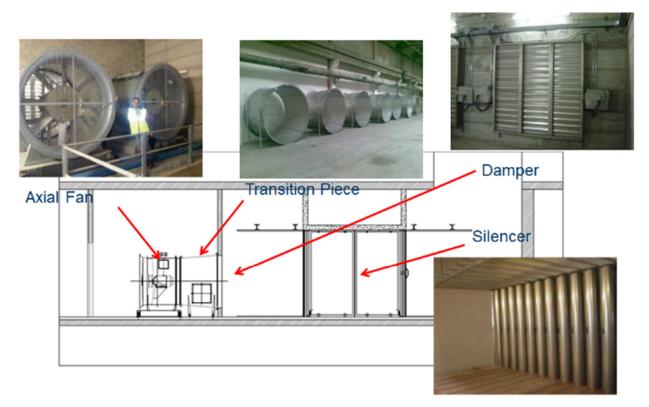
Typical ventilation chamber arrangement – courtesy of Systemair
